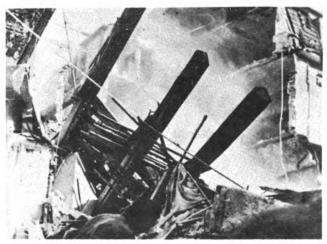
Captured photo showing damage to building 64 and connecting bridge between 64 and building 42.
